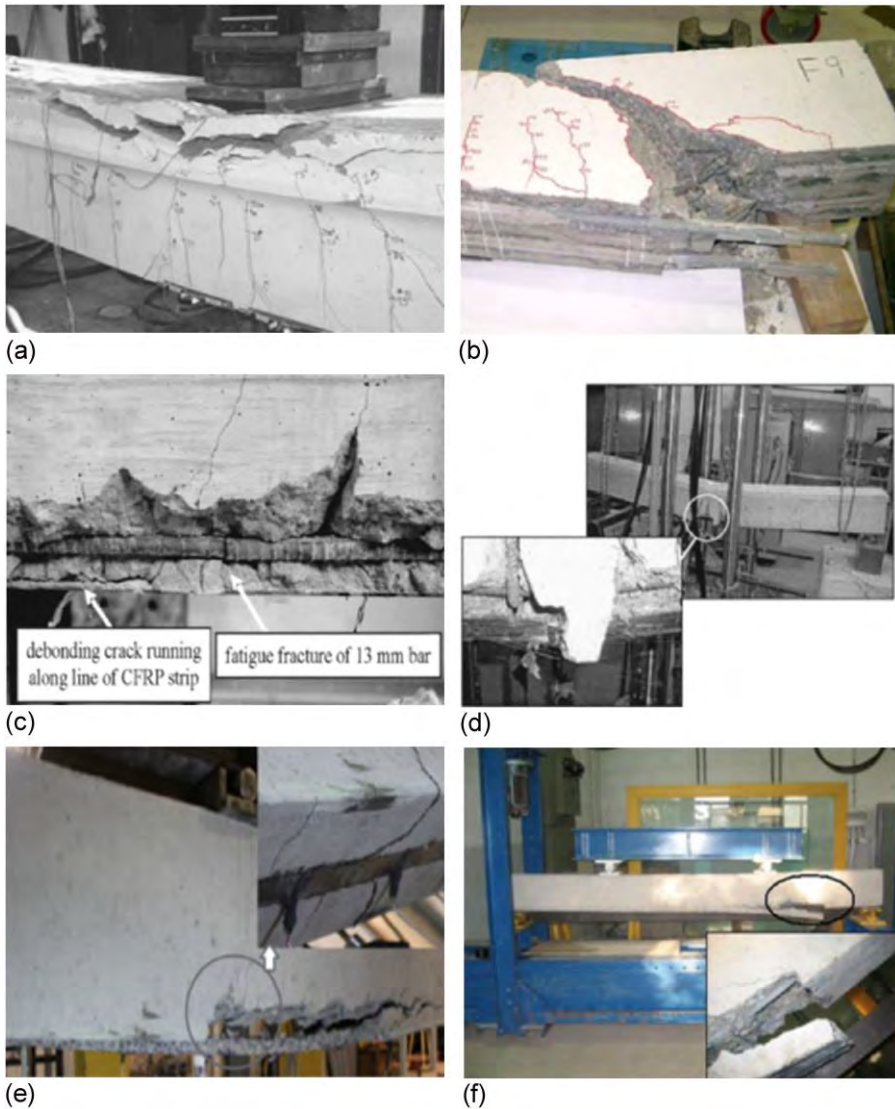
Failure modes of RC beams strengthened by NSM FRP: (a) Concrete crushing [66], (b) Shear failure [62], (c) Steel reinforcement rupture [65], (d) FRP rupture [61], (e) Interfacial debonding failure [64] and (f) Debonding failure due to concrete cover separation [75].
